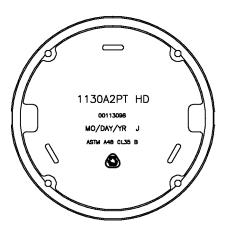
MANHOLE RISER COVER WITH INSPECTION/VENT OPENING DETAIL
